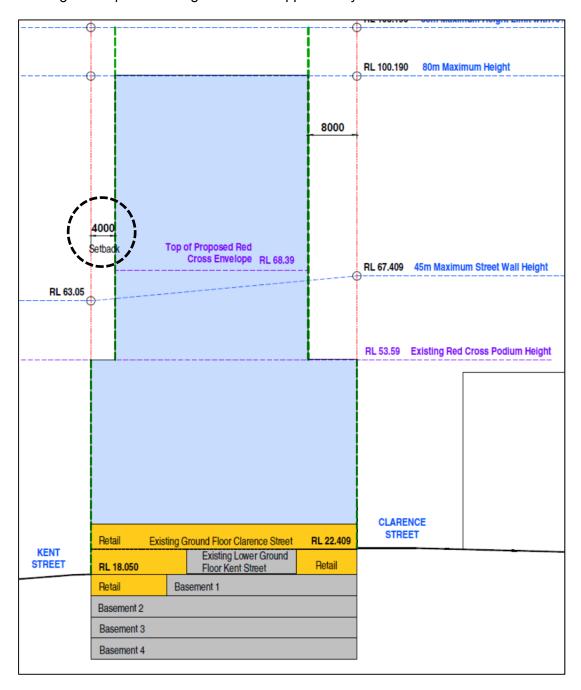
A cross section of the proposed modified building envelope, illustrating a 4-metre setback to Kent Street for all tower floor levels
